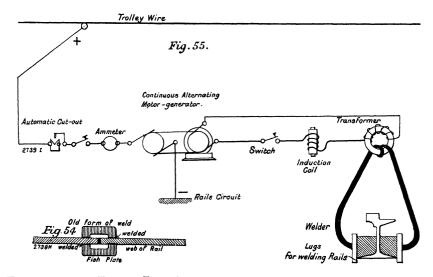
First Form of Welded Rail Joint. Fig. 55. Diagram of Rail Welding Circuit.
